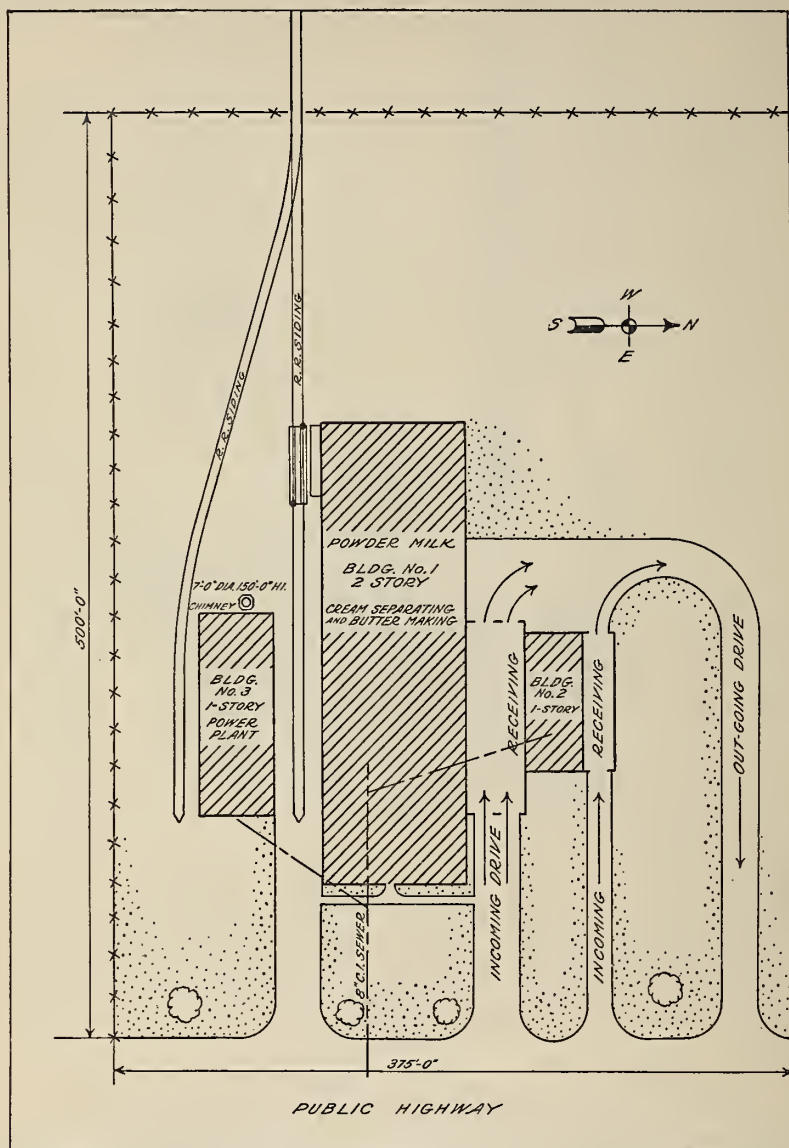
Plot plan of country station no. 2 of the proposed unified system.
